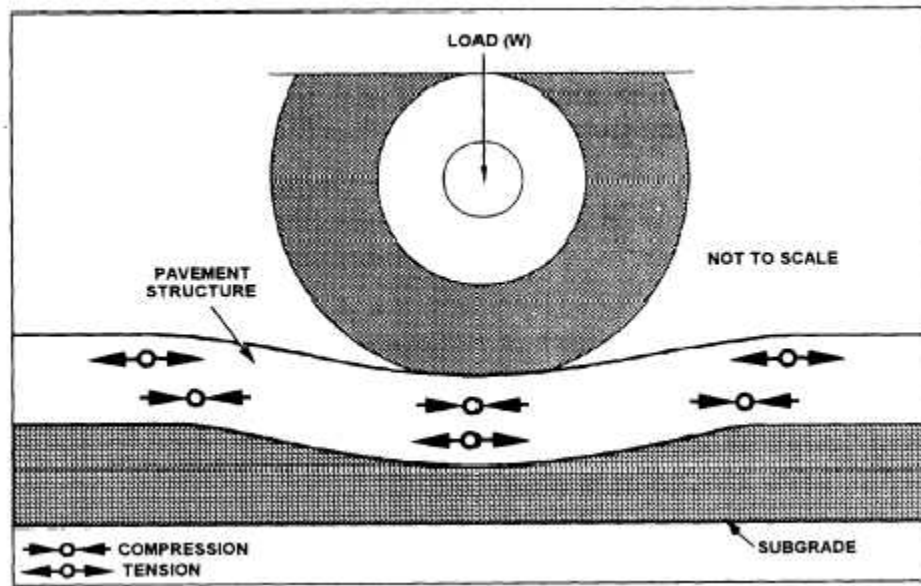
Pavement Deflection Results in Pavement Structure
